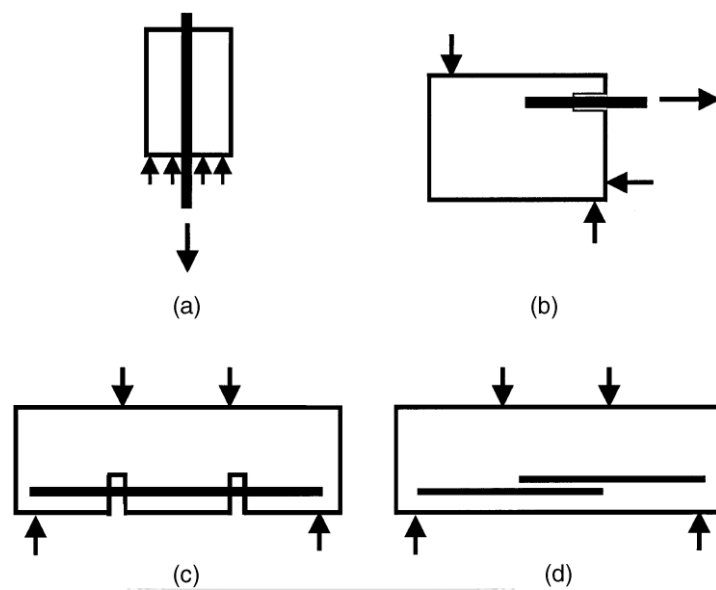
Types of specimens used to study bond between steel bars and concrete (a) pull-out specimen, (b) beam end specimen, (c) beam anchorage specimen, and (d) beam splice specimen [45].
